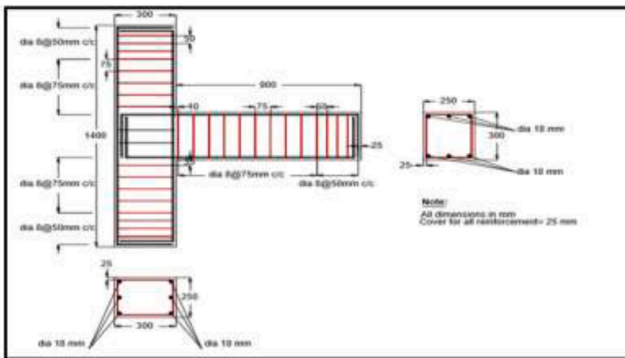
Reinforcement Detailing and Dimensions for BCJ-S-18MM [8]
